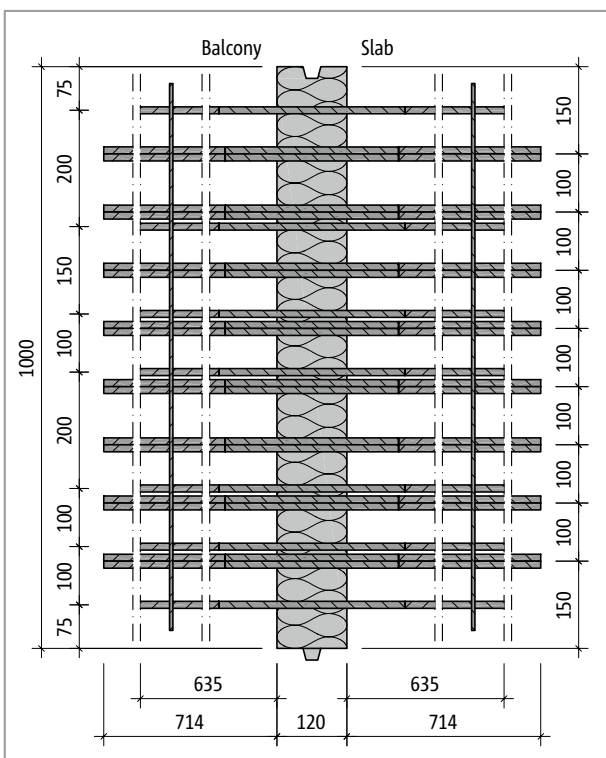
Schöck Isokorb® XT type D-MM3-VV5: Layout
